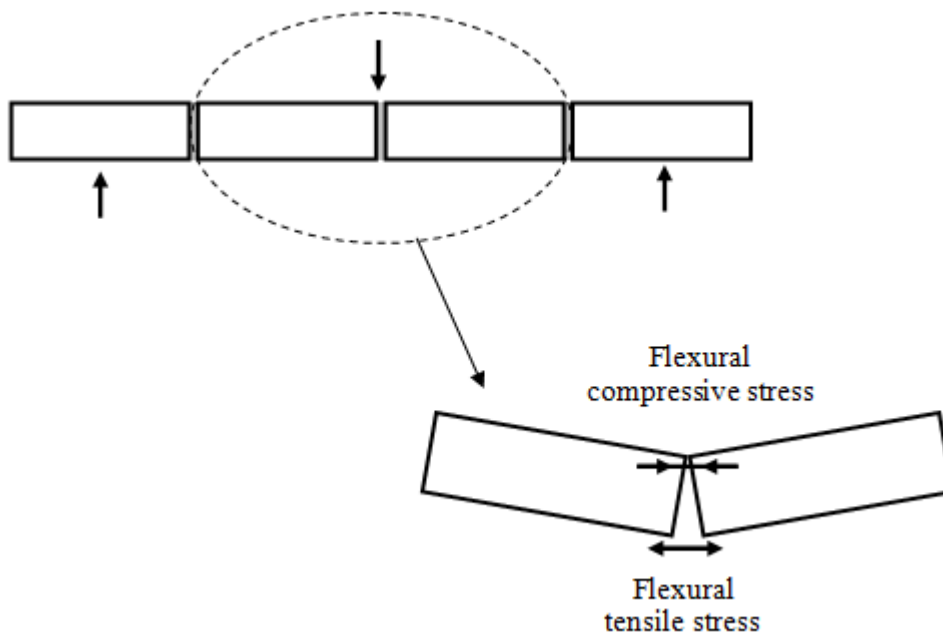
Flexural tensile stresses in a masonry panel (plane of failure perpendicular to the bed joints)
